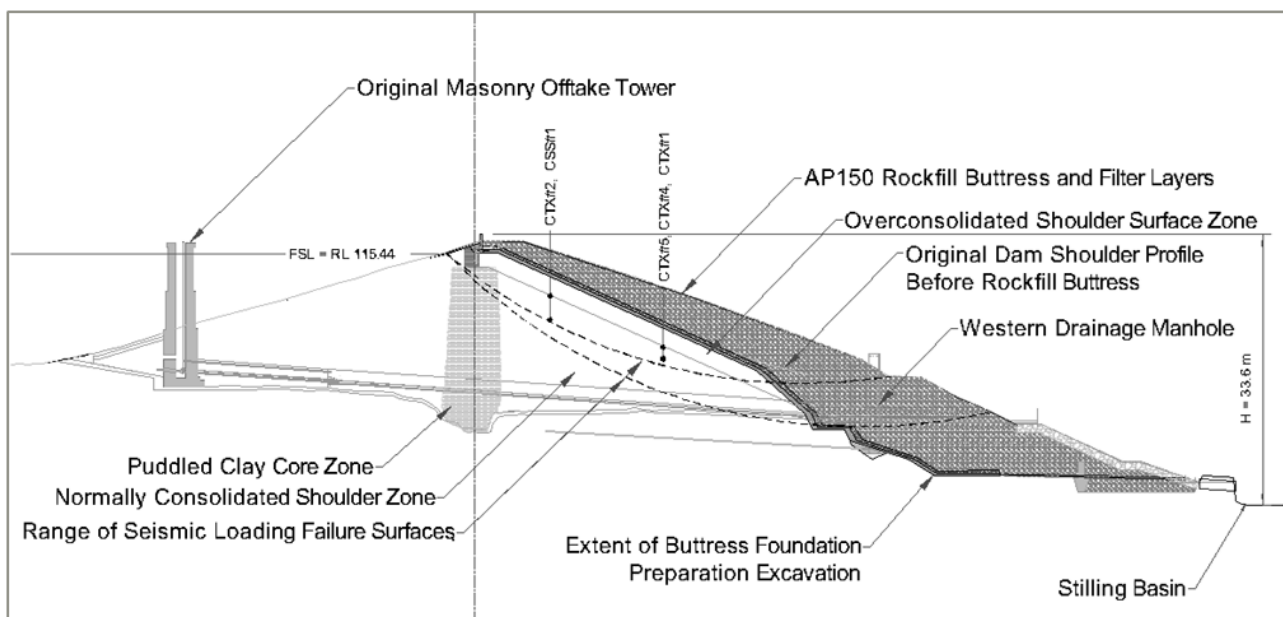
Representative skewed maximum cross section of dam showing projected locations of test samples.
